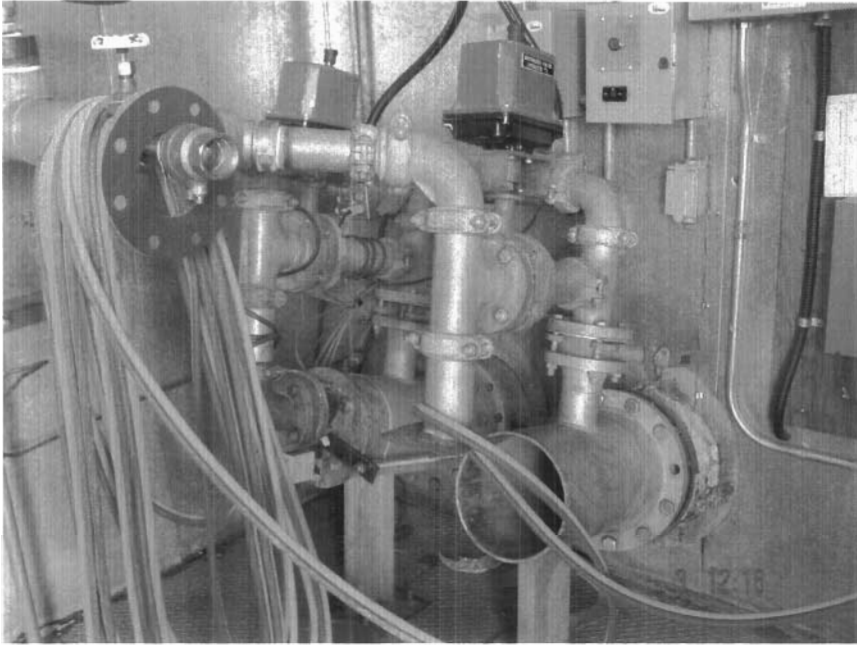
Interior of new water intake facility, piping for intake pump shown.
